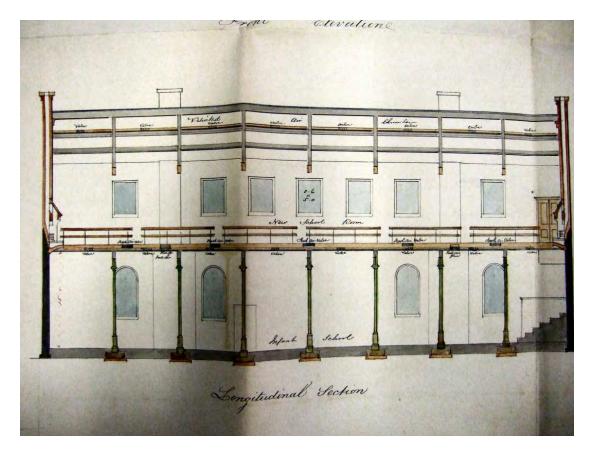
Internal cross section of the infants'/girls' school (Site 20) (PRO SP 246)
